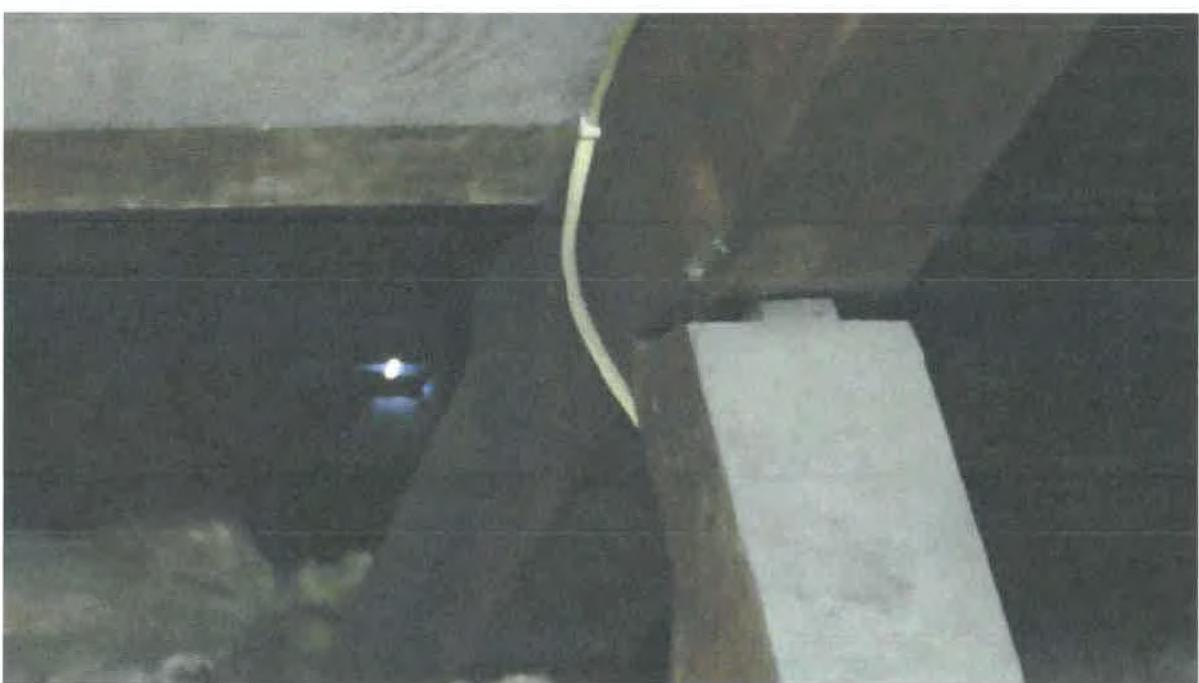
Typical timber purlins bearing into cross walls, common timber rafters, slating battens, lime parging (torching) to the underside of the natural stone slates & ceiling joist hangers.
